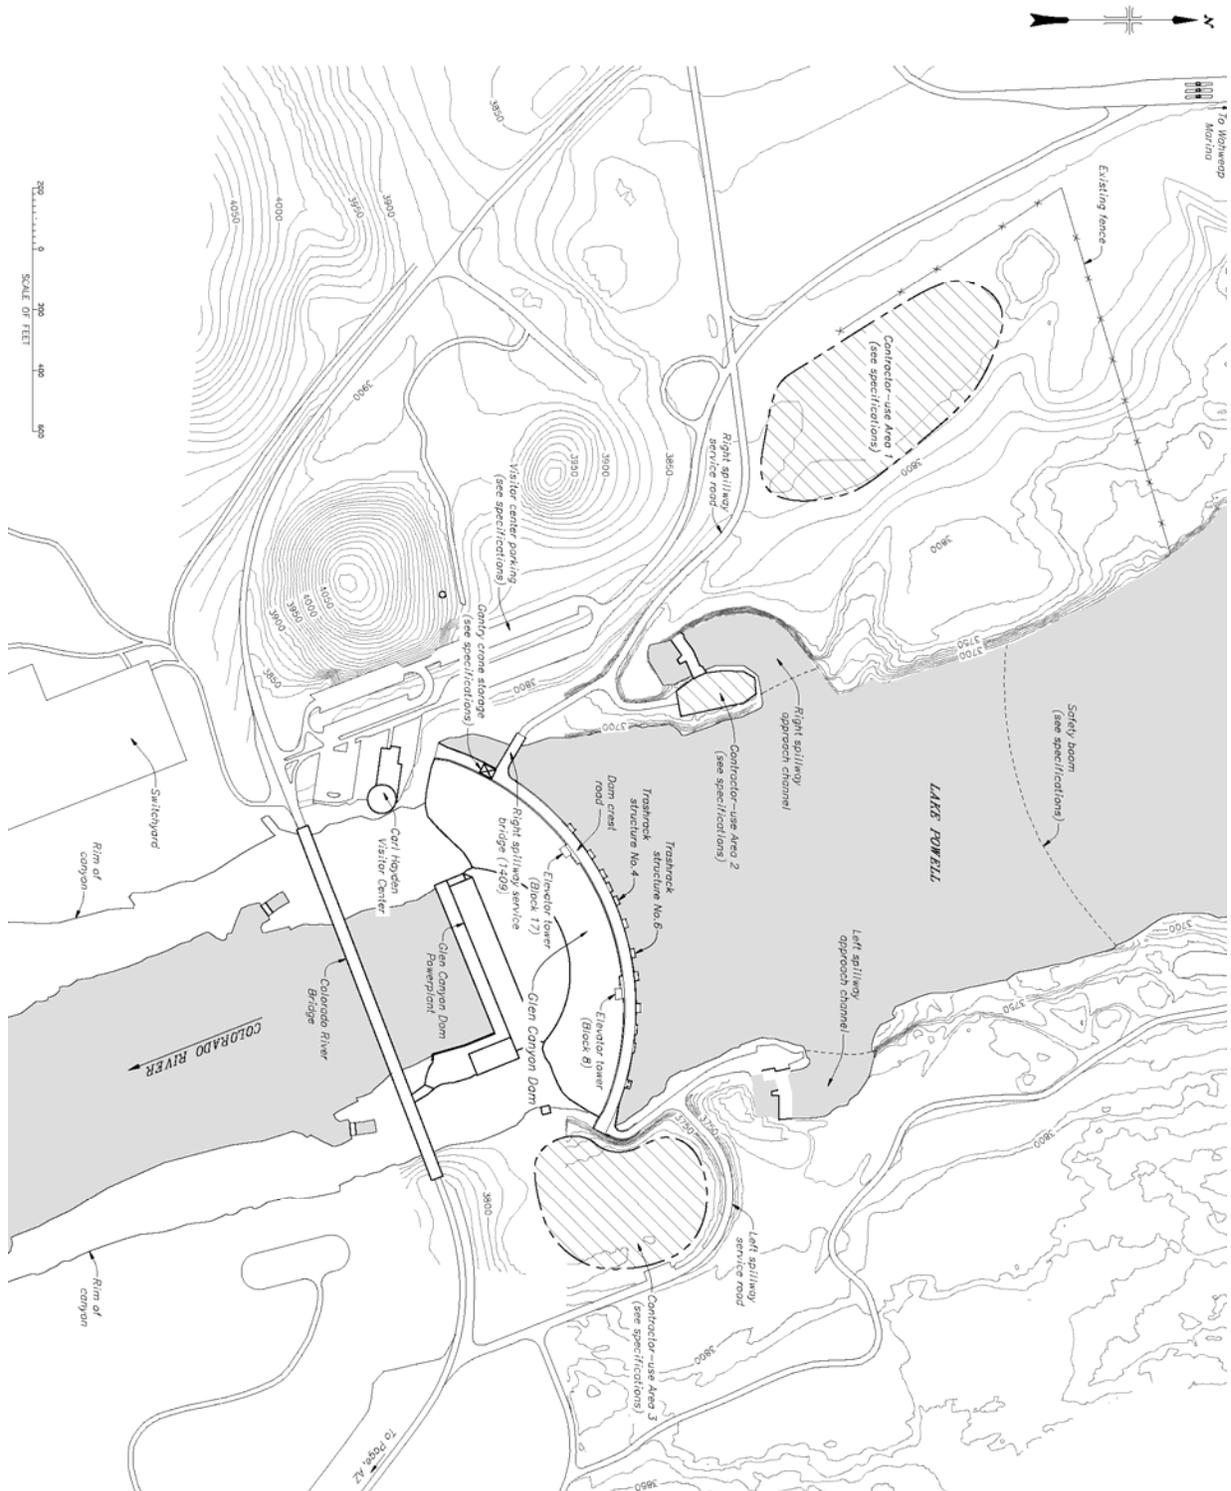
General plan view of Glen Canyon Dam that shows the proposed TCD locations at trashrack structures No. 4 and No. 6 and other major features.
